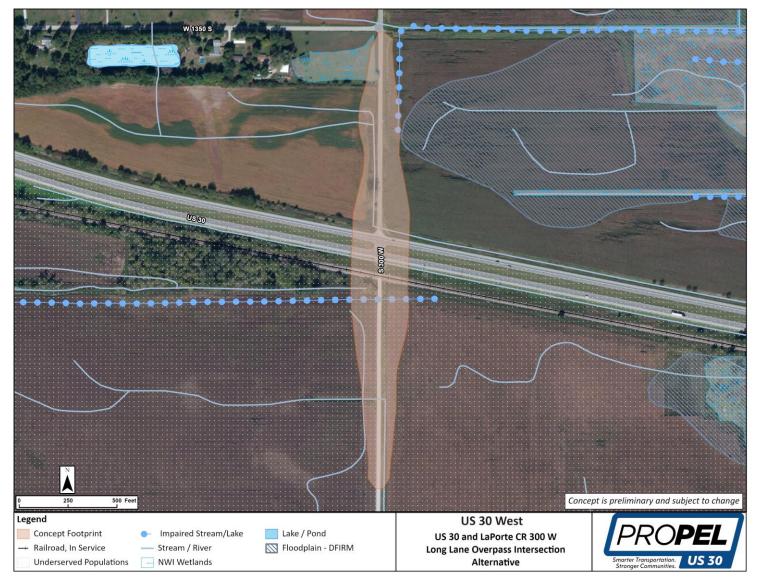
US 30 and LaPorte CR 300 W Long Lane – Cross Road Overpass/Underpass Alternative – LaPorte CR 300 W Over US 30
